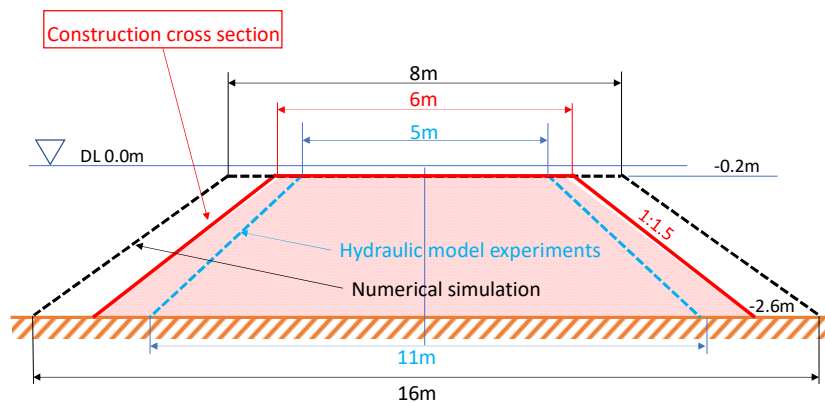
(7) Cross section of submerged breakwater (at the tip of submerged breakwater)
